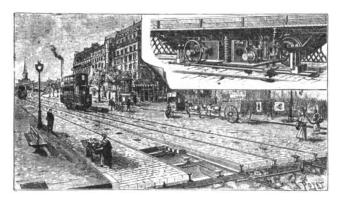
View Showing Construction of Claret-Vuilleumier Railway System.
